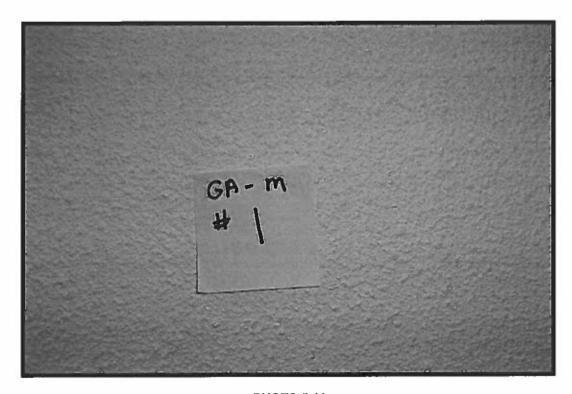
Sample GA - M - 1 : Non-asbestos ceiling texture coat in Office B (main floor). Typical of ceiling texture coat found within other common areas within the building.
